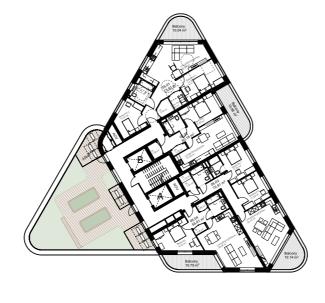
5th floor plan (not to scale). Source: Stockwool.
